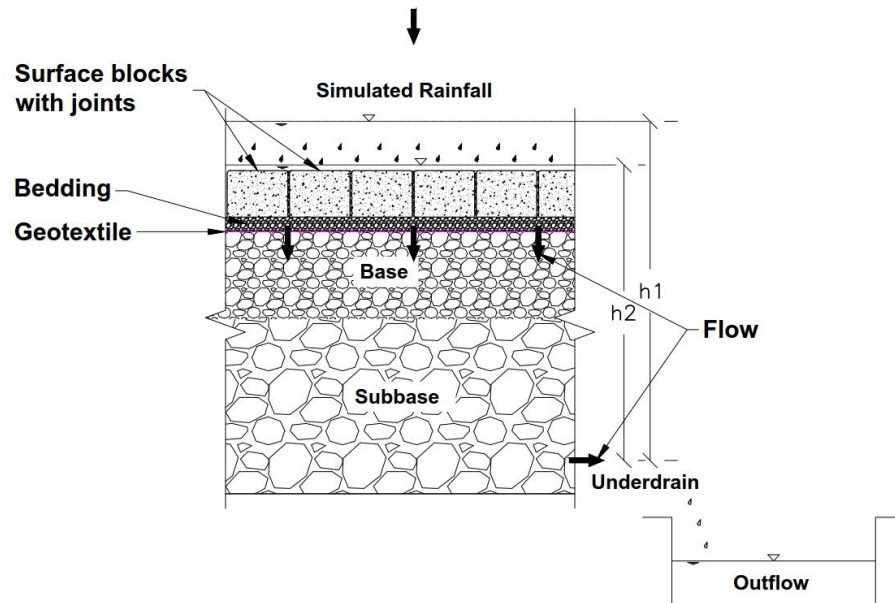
Details of hydraulic conductivity testing of the permeable pavement rigs
